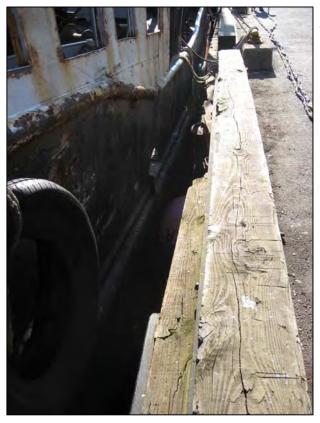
Docked vessel against the timber wale from Station 5+91 looking south.
